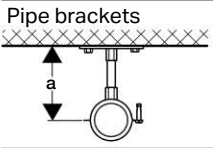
For greater wall or ceiling distances from the anchor points, we recommend installing support fastenings
